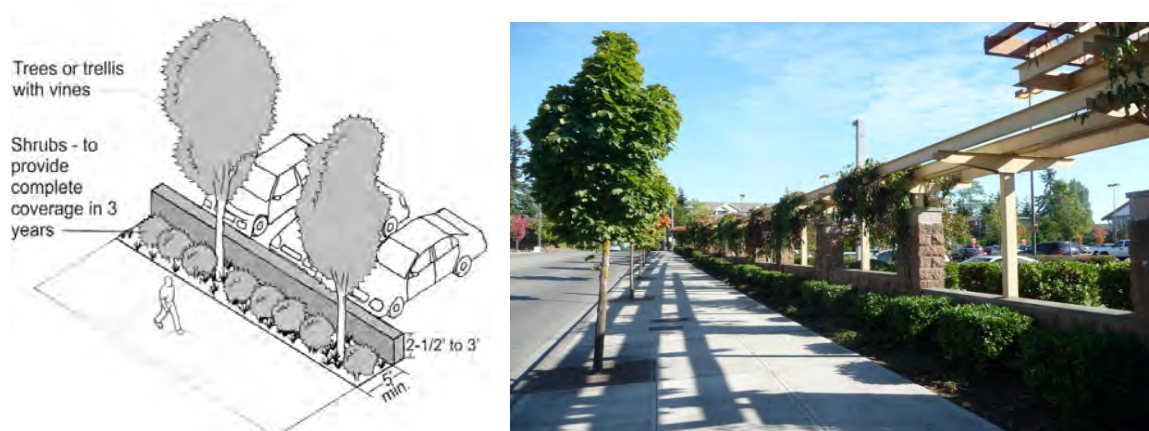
B.12: Parking area planting buffer with low wall and landscaping. Illustration with trees (left) and example with trellis (right).
